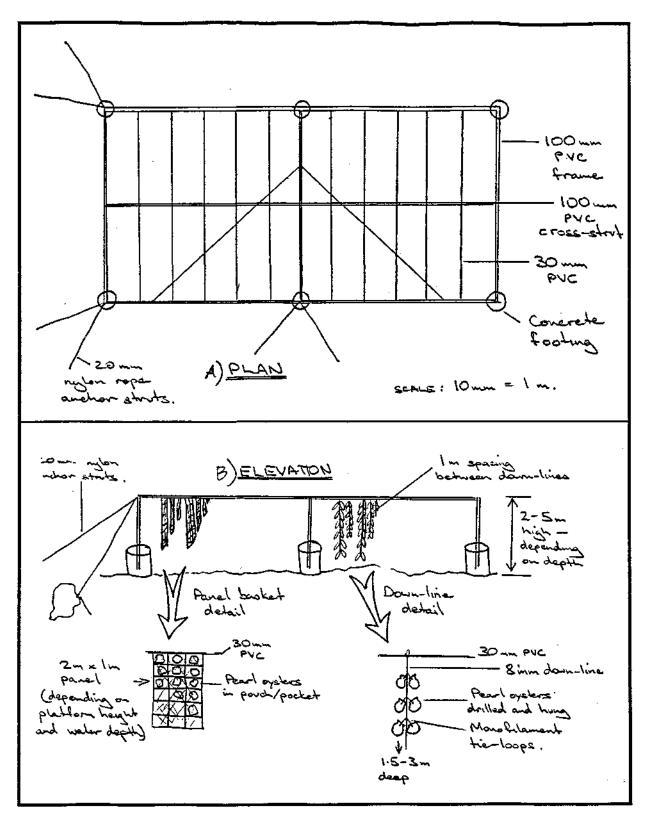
Suggested design for pearl oyster culture platform in Kiritimati lagoon: a) Plan; b) Elevation.
